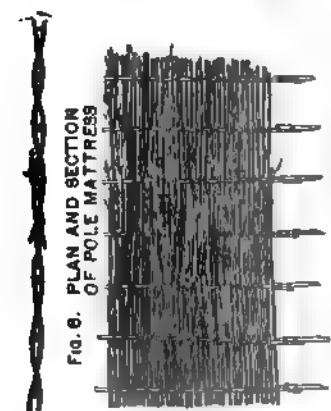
PLAN AND SECTION OF POLE MATTRESS
